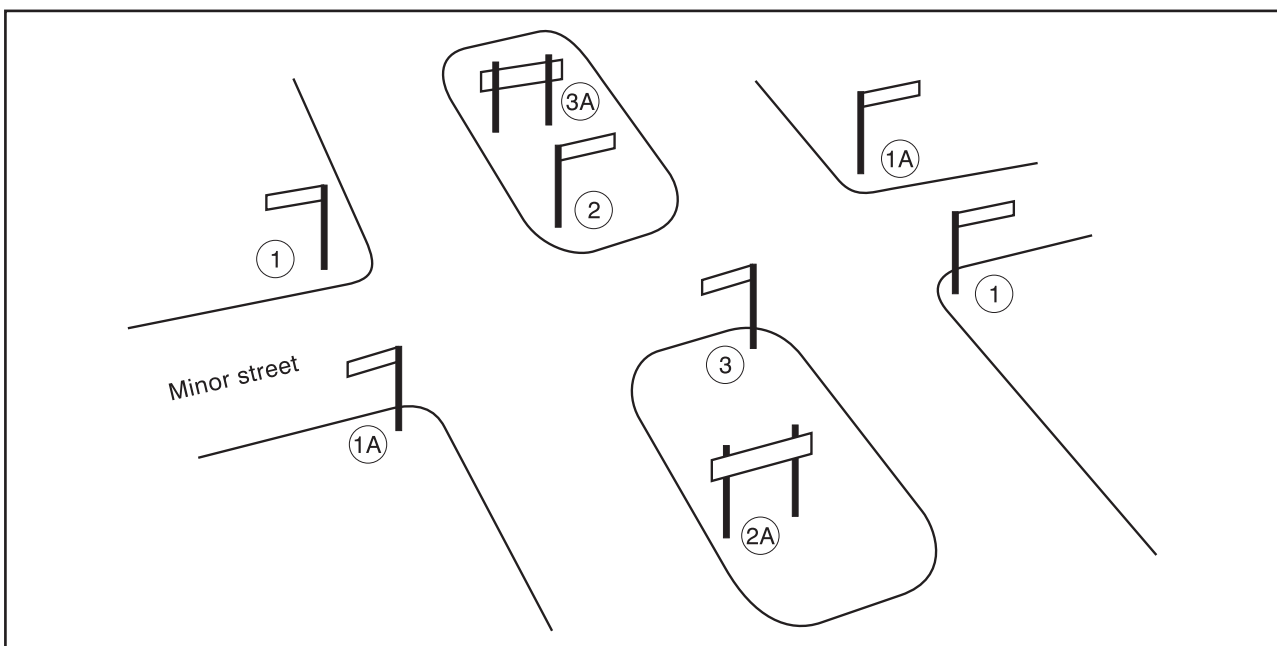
DIVIDED MAJOR STREET INTERSECTION WITH MEDIAN OPENING
